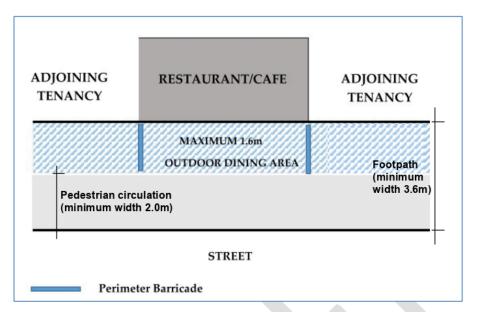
Dimensions for outdoor dining for all other locations with or without parking adjoining
